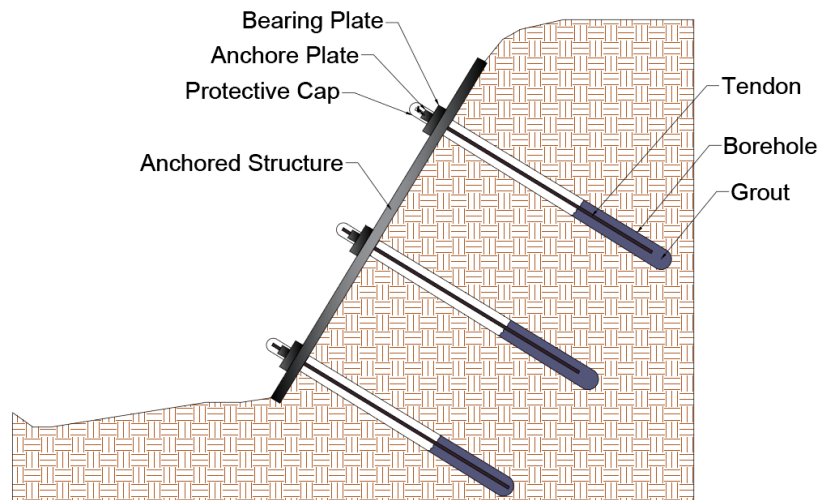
Components of a general ground anchor system (Shahandashti et al. 2019)
